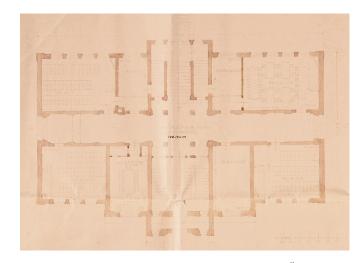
First floor plan of primary school building in Šiauliai (eng. archit. Karolis Reisonas, 1926) [drawing from LCVA].
